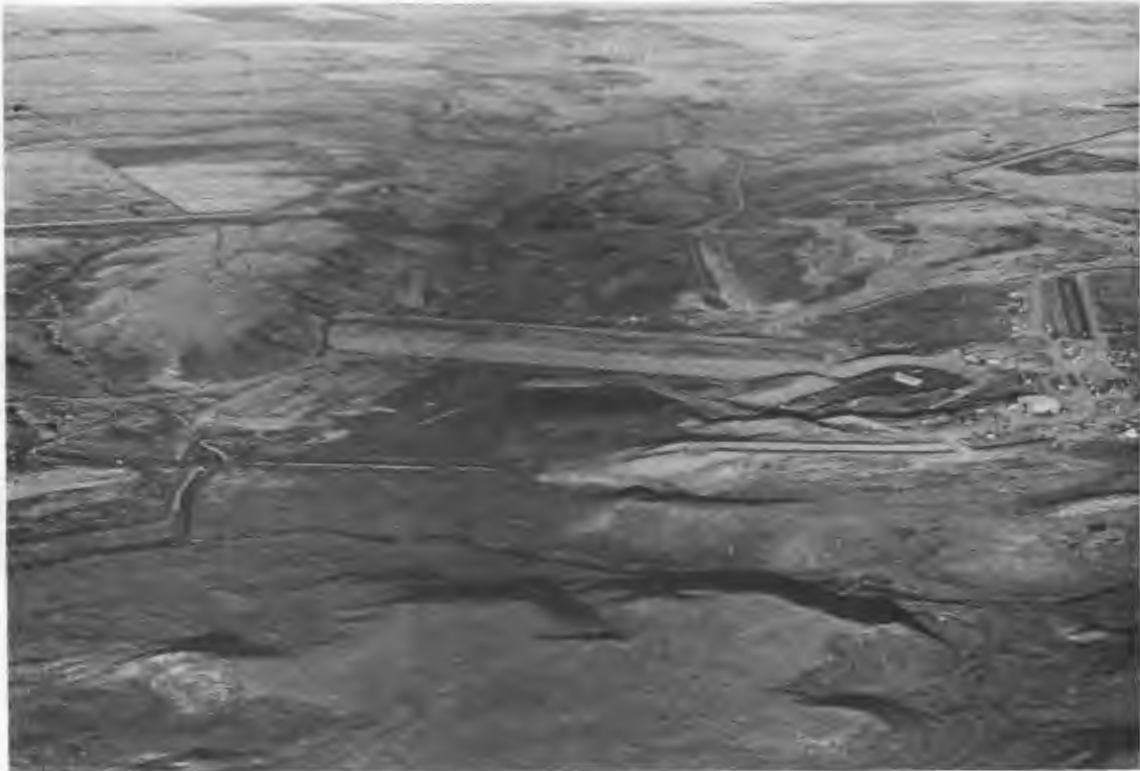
Aerial View Looking SE Towards the West Dam Site While Under Construction.
